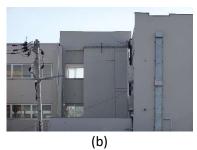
Building W2: (a) Overview of School W2, (b) Overview of South Building, (c) Overview of North
